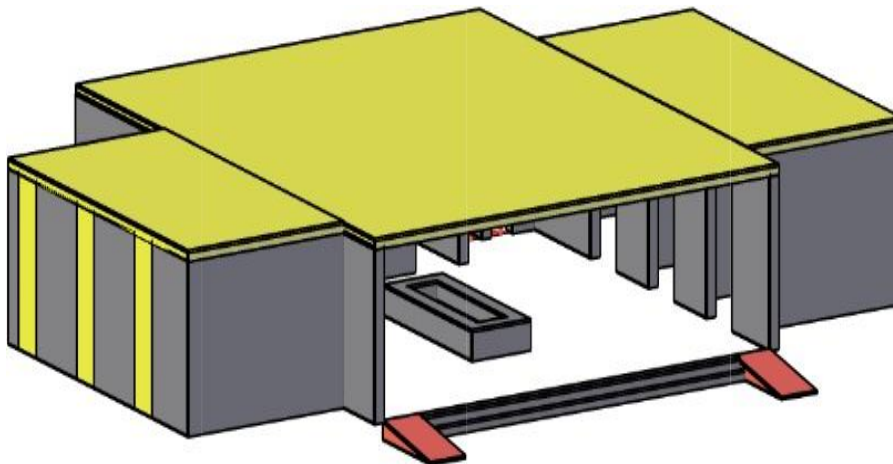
3D LAYOUT OF MUSEUM BUILDING
